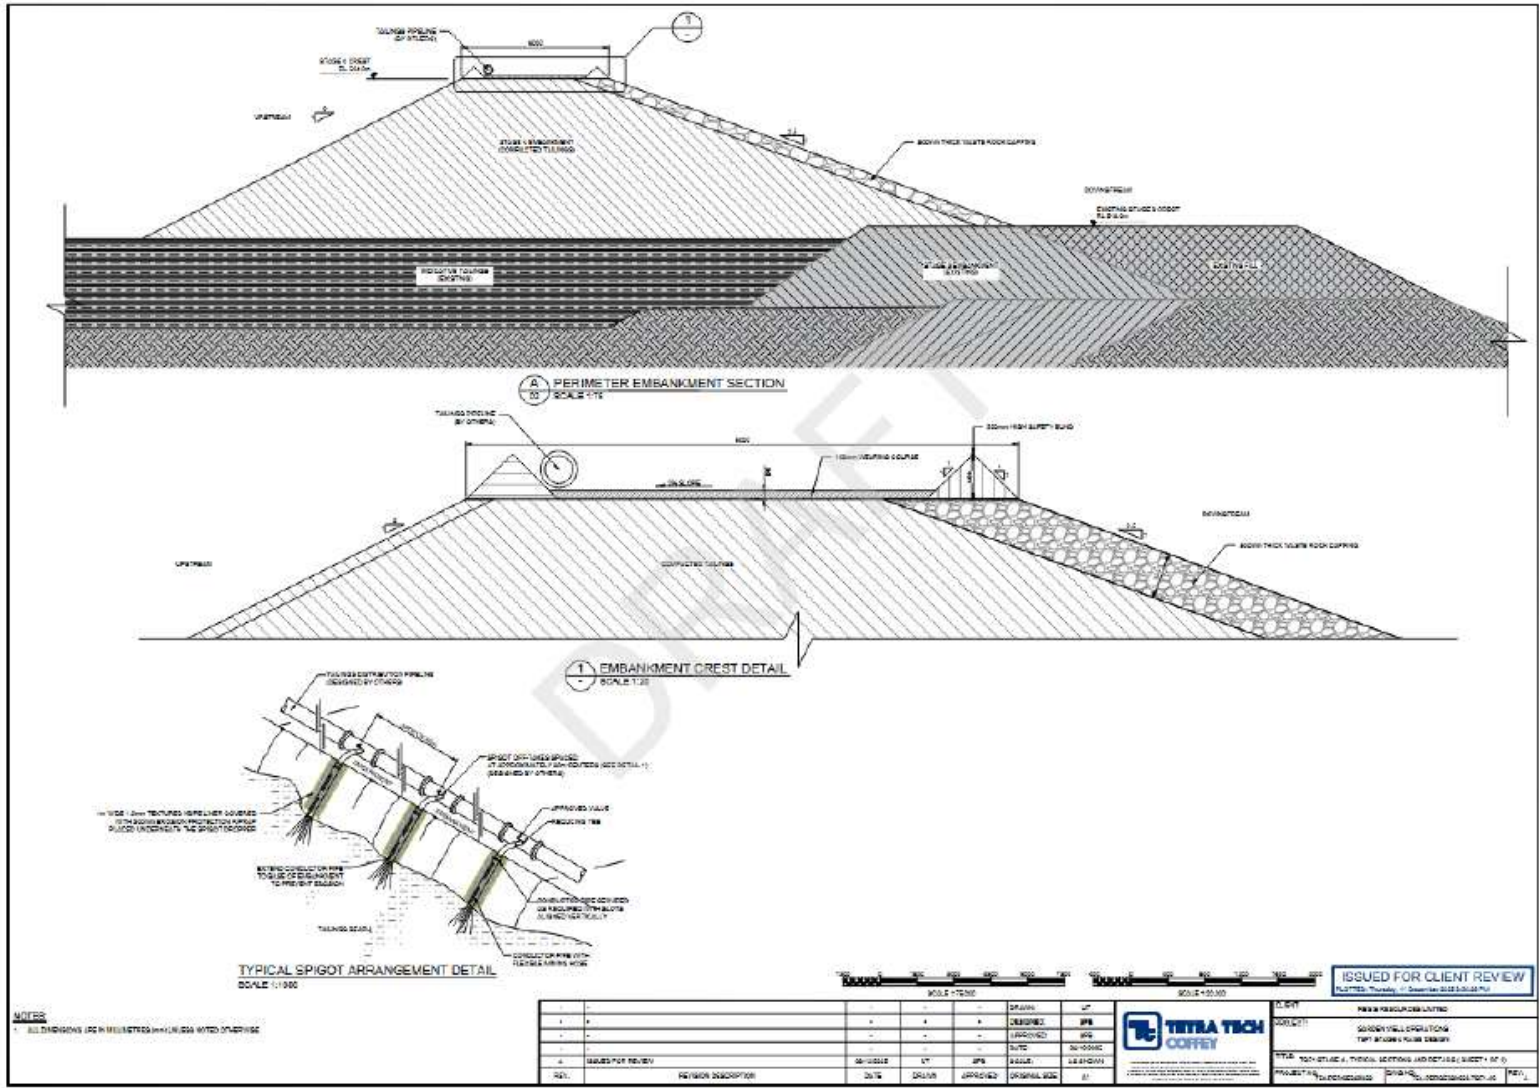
Cross section of the 6m upstream embankment raise stages 4 for Garden Well TSF 1
